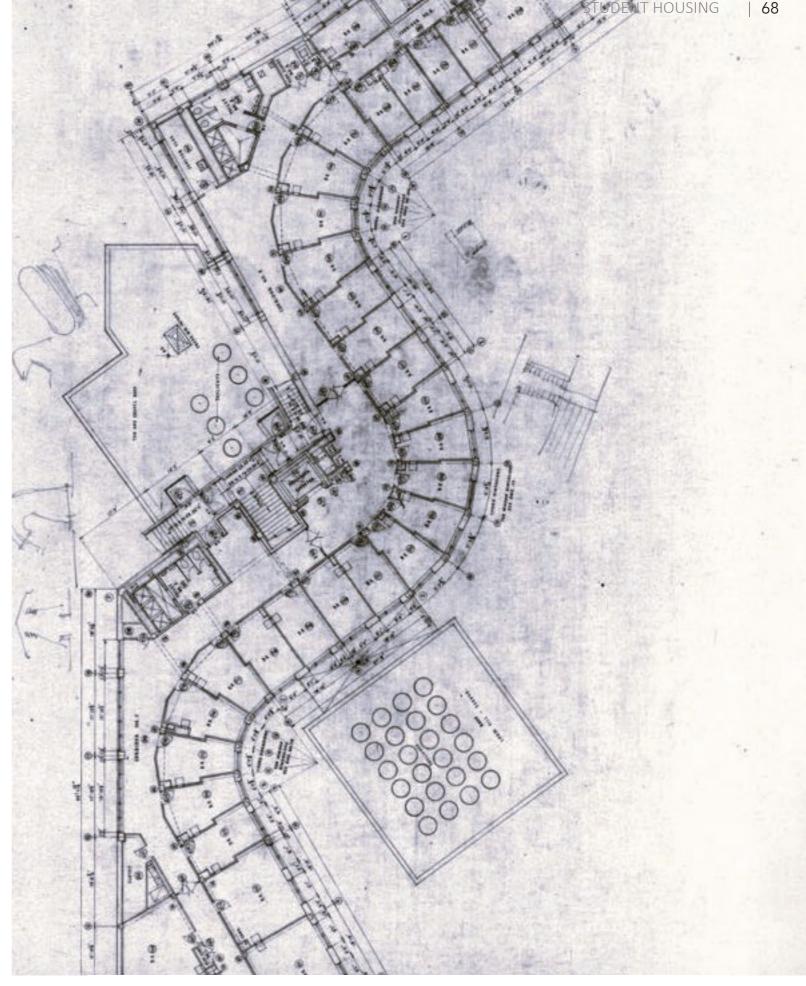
Floor plan of Baker House Dormitory at MIT, designed by Alvar Aalto (1946–1949). The plan illustrates the undulating linear corridor system aimed at enhancing spatial variety and natural lighting. (Source: Alvar Aalto Foundation, "Alvar Aalto's Life)
